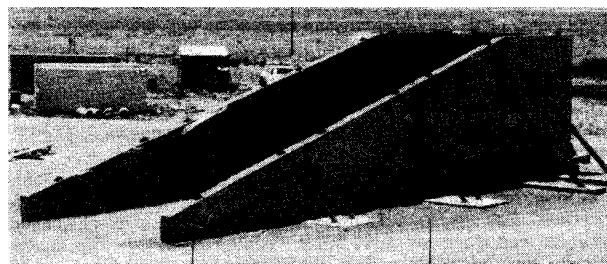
Photograph of Packer Demonstration Facility prior to installing external plumbing.
